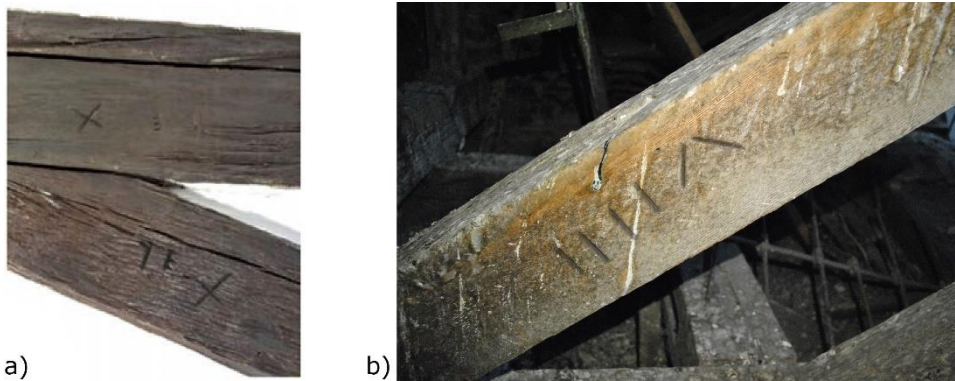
Markings on timber elements a) Carpenters mark, b) numbering of timber elements
